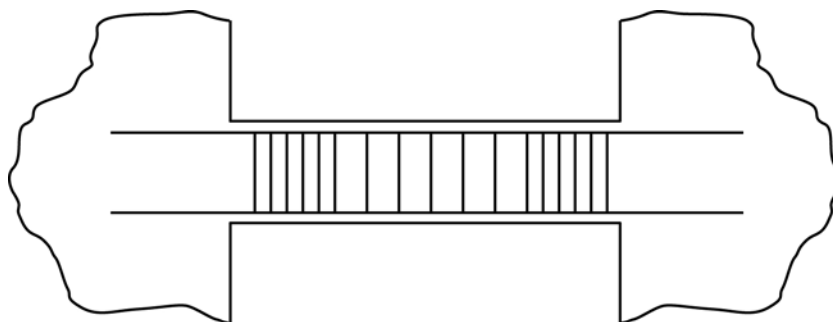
Ductile detailing for reinforcement of flexure-controlled coupling beams.
